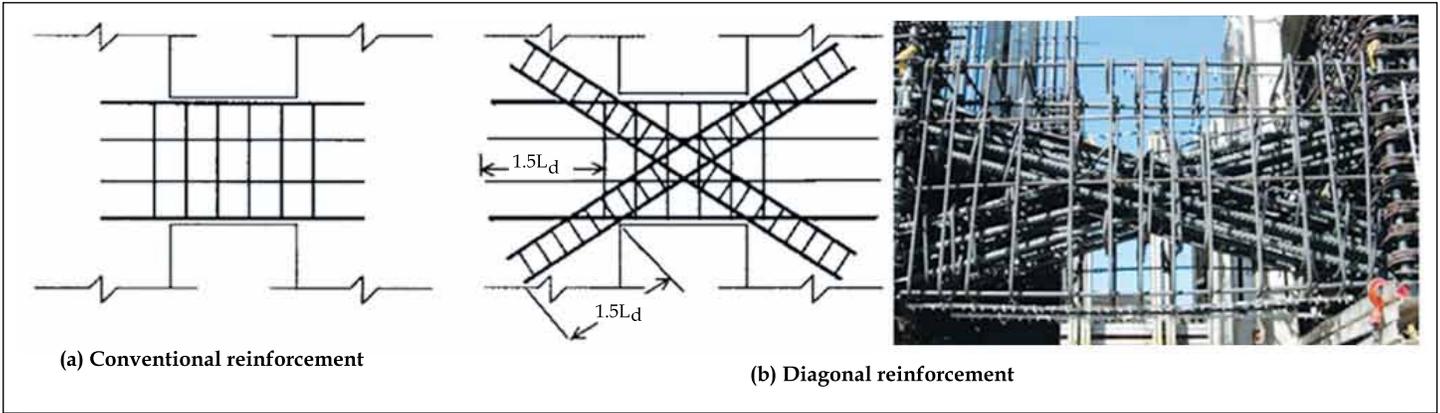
Diagonal reinforcement in a story-high coupling beam, an innovation introduced by Prof. Paulay and followed internationally
